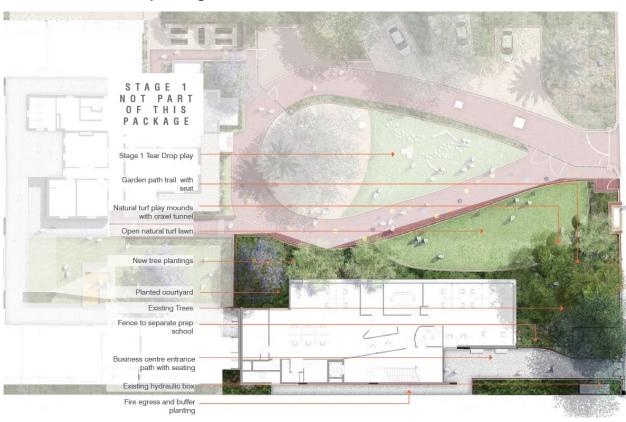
below illustrates the proposed landscape design for each campus. The full details of the Landscape Plan with plant species can be viewed at Appendix E.
